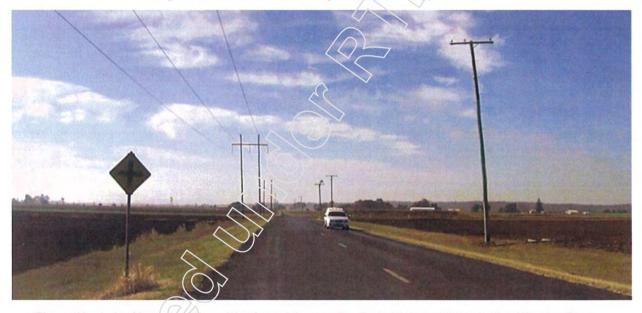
Lake Clarendon Way - Westbound Approach - Faded Advance Intersection Warning Sign
